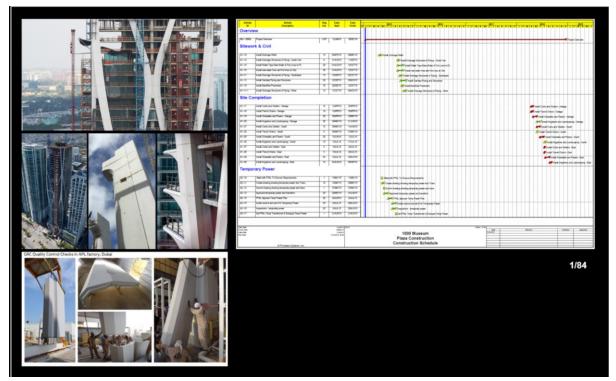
a.7 Site photos and construction sequence using precast GFRC panels
